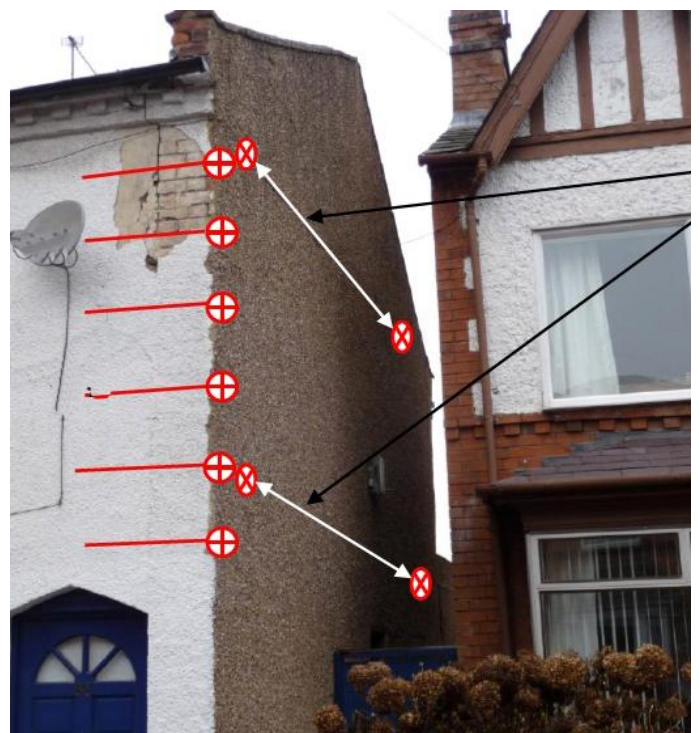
showing details of bow tie fixings at 600mm vertical centres (black arrows) tied into joists. 1200mm long CemTies installed through gable wall into both front and rear walls, generally at 450mm centres.
